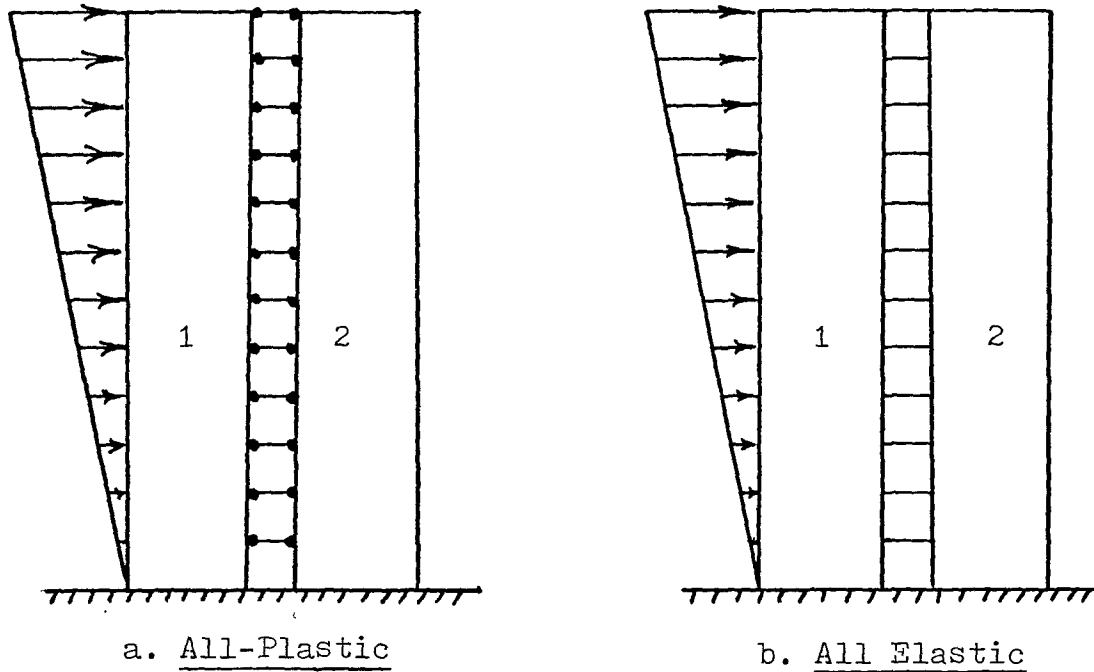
STATIC CASES CONSIDERED FOR WALL HINGE FORMATION
